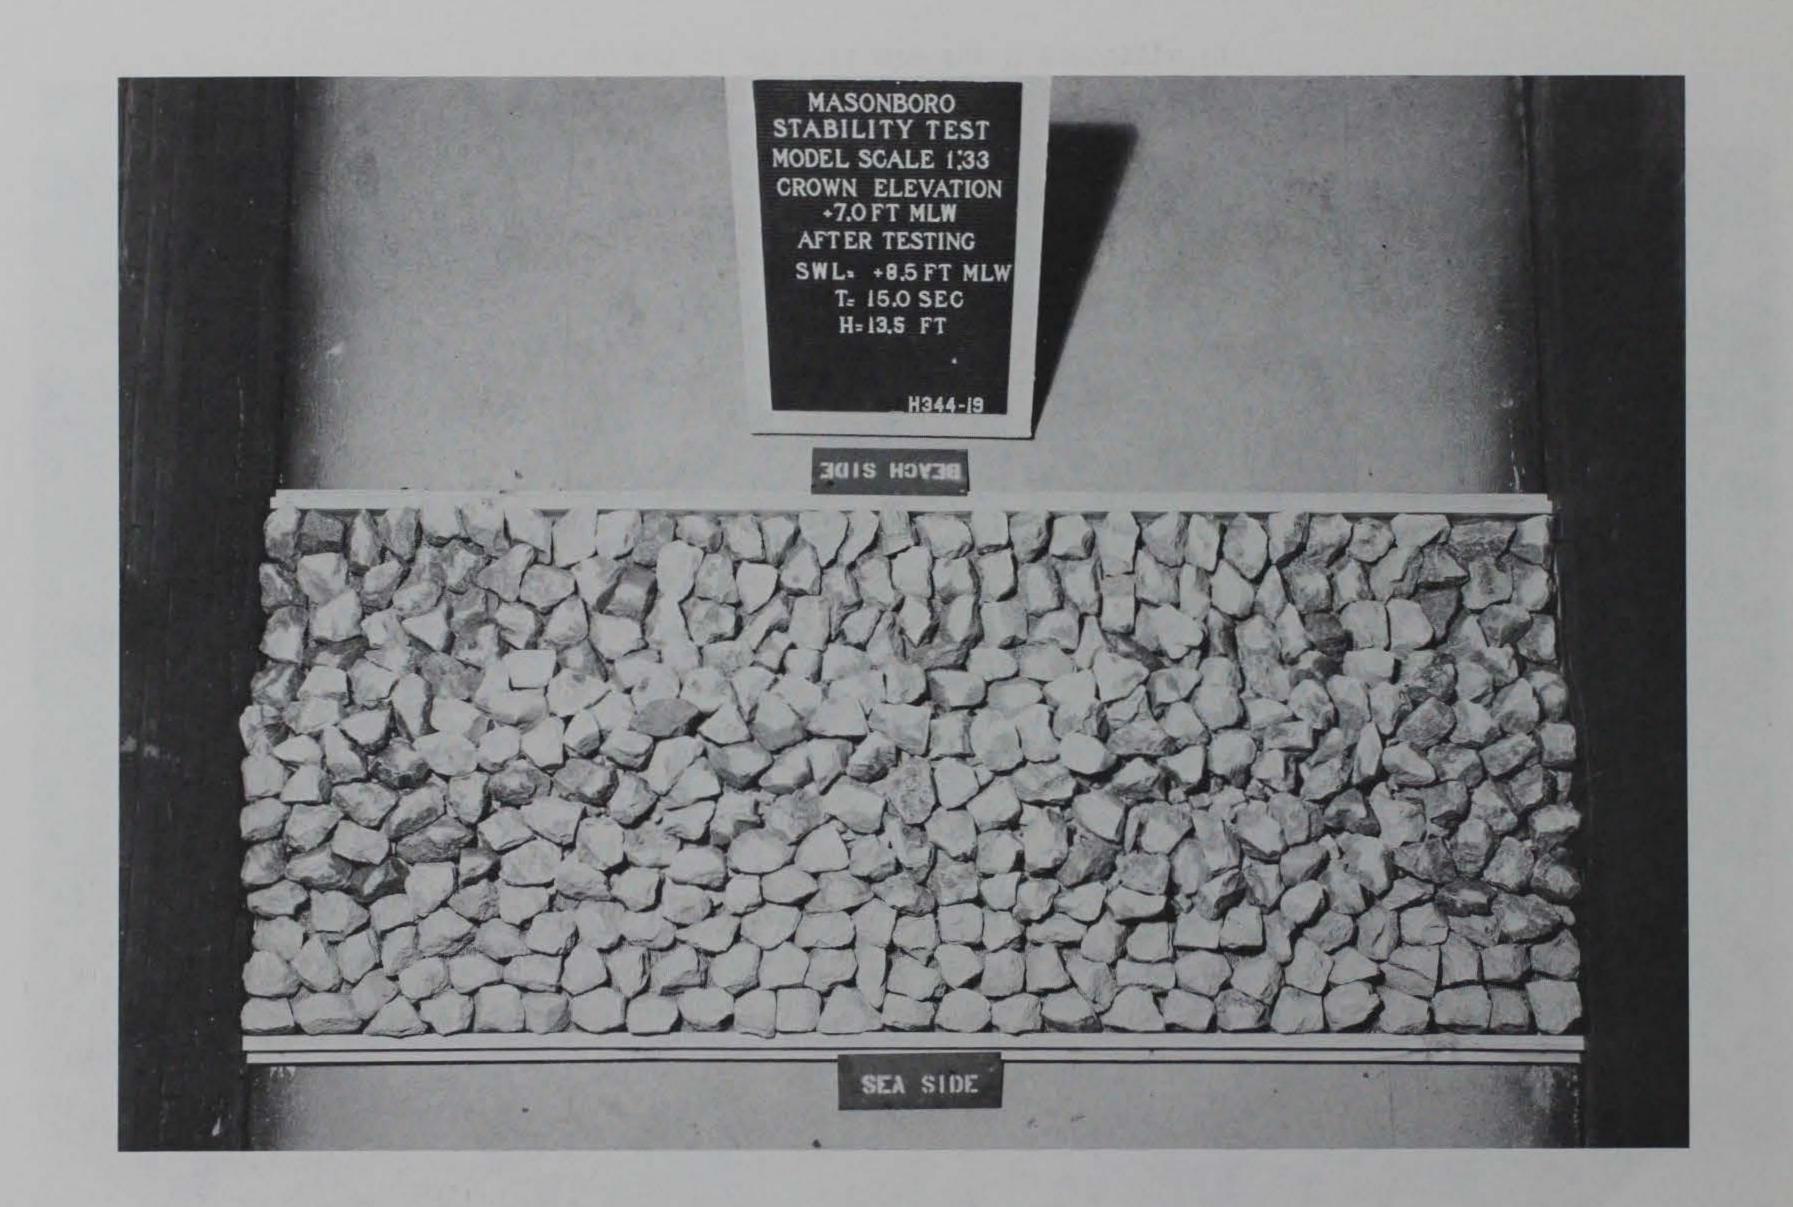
Overhead view of Plan 3A after attack of 15-sec, 13.5-ft waves at an swl of +8.5 ft mlw for 2 prototype hr
